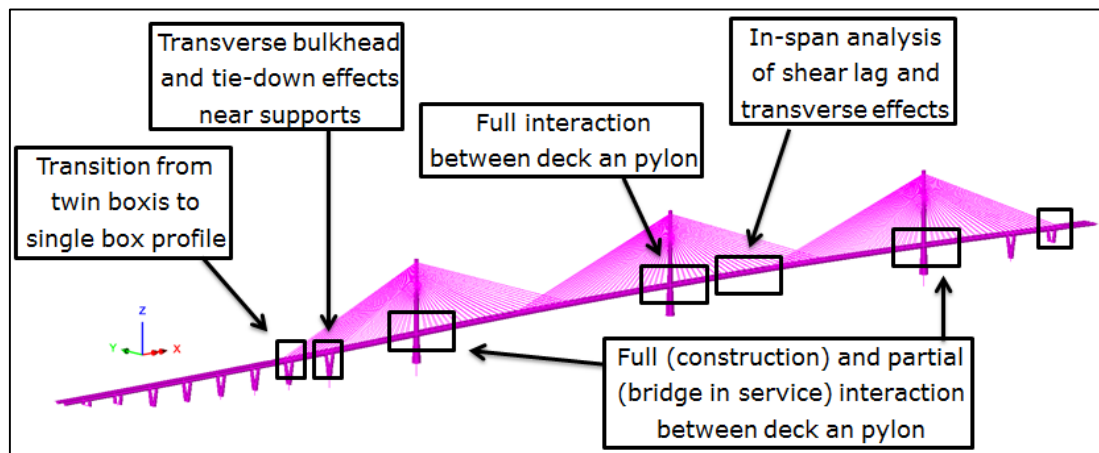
Overall structural model (Kærn, et al., 2017)
